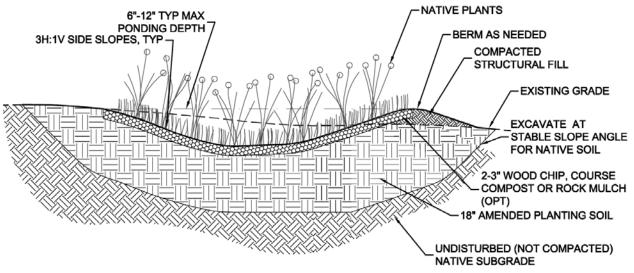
An example of an "Infiltration Rain Garden with Amended Planting Soil". Not pictured, but also applicable to the above criteria are versions of a stormwater planter or LID swale (see Appendix F Standard Details).
